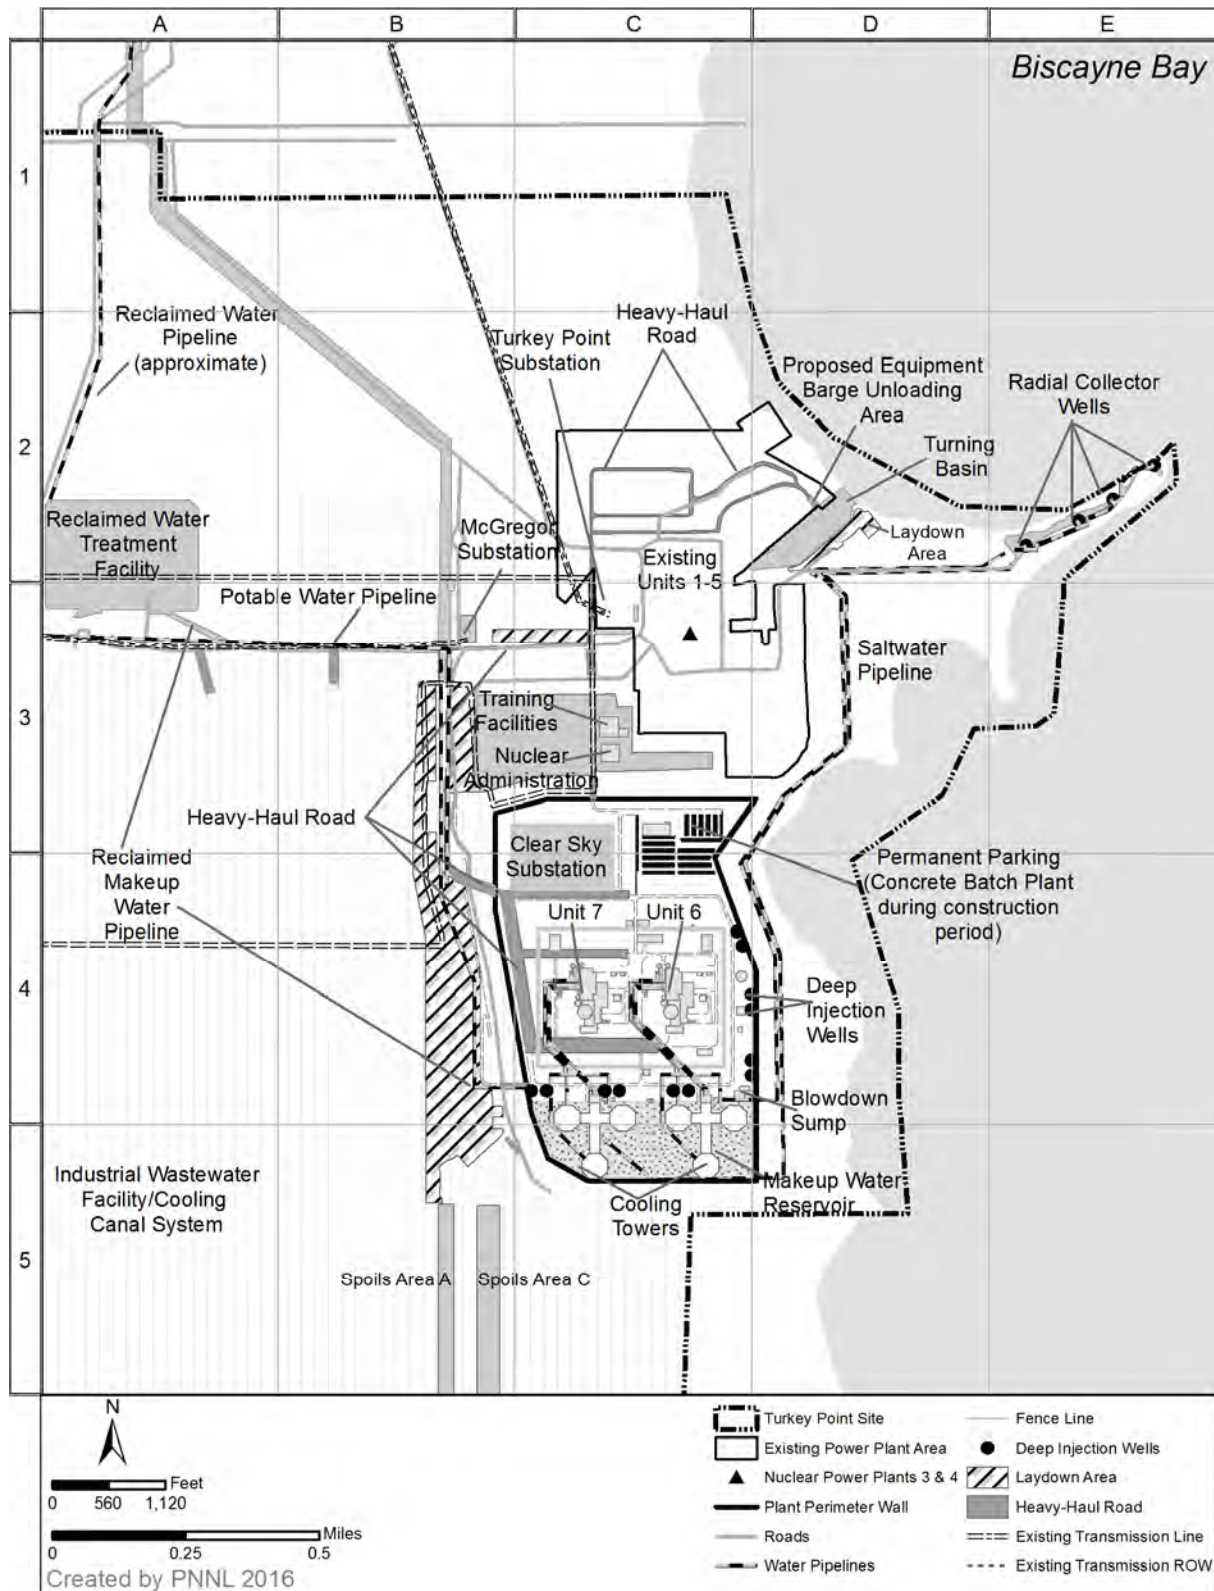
Site Layout for Proposed Turkey Point Units 6 and 7 and Associated Facilities
